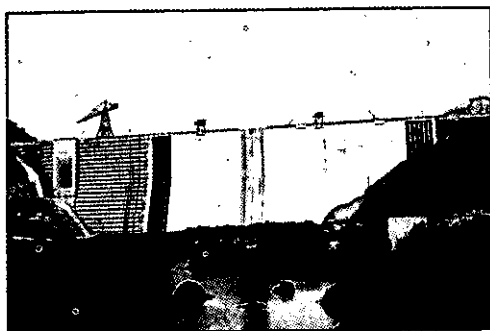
Pracana dam showing installation of anchorage profile/drainage conduits, drainage geonet and PVC liner from left to right. The waterproofing system was installed to mitigate the effects of AAR
